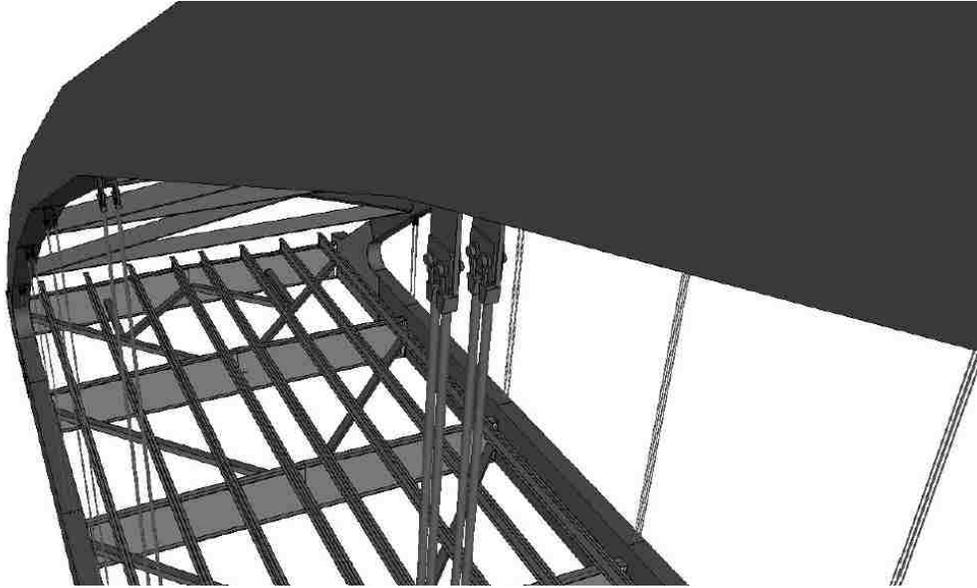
View of Tied Arch floorsystem: Stringers, Floorbeams, Lower laterals
